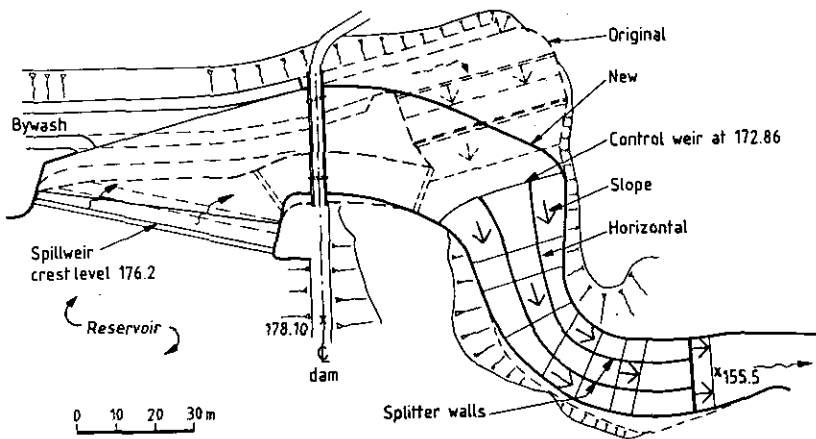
Proposed modifications to spillway at Upper Bohernabreena
